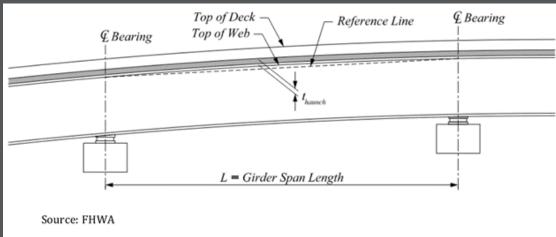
Steel Girder Span Profile Grade Adjustment for Crest Curves
